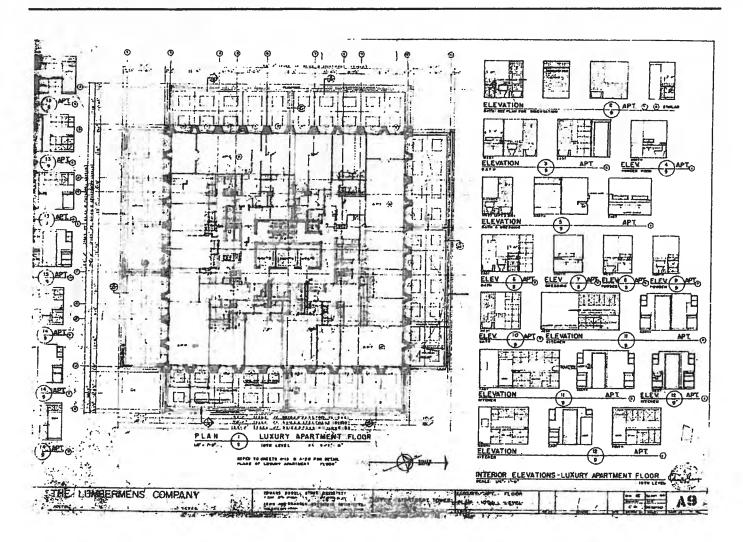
Plan for Level 10, luxury apartment floor with terraces.
